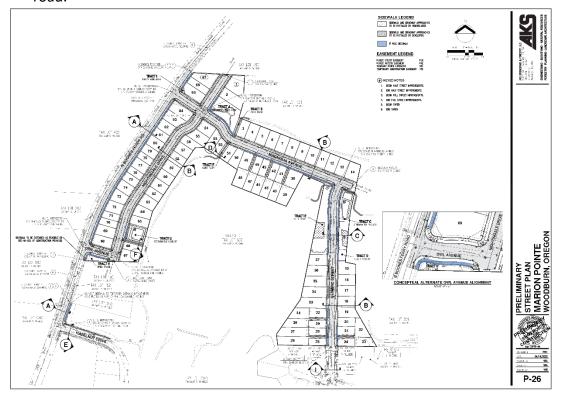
Site Plan Sheet P-26 Sidewalks (blue: min 8 ft wide); see Attachment 103 for full size
